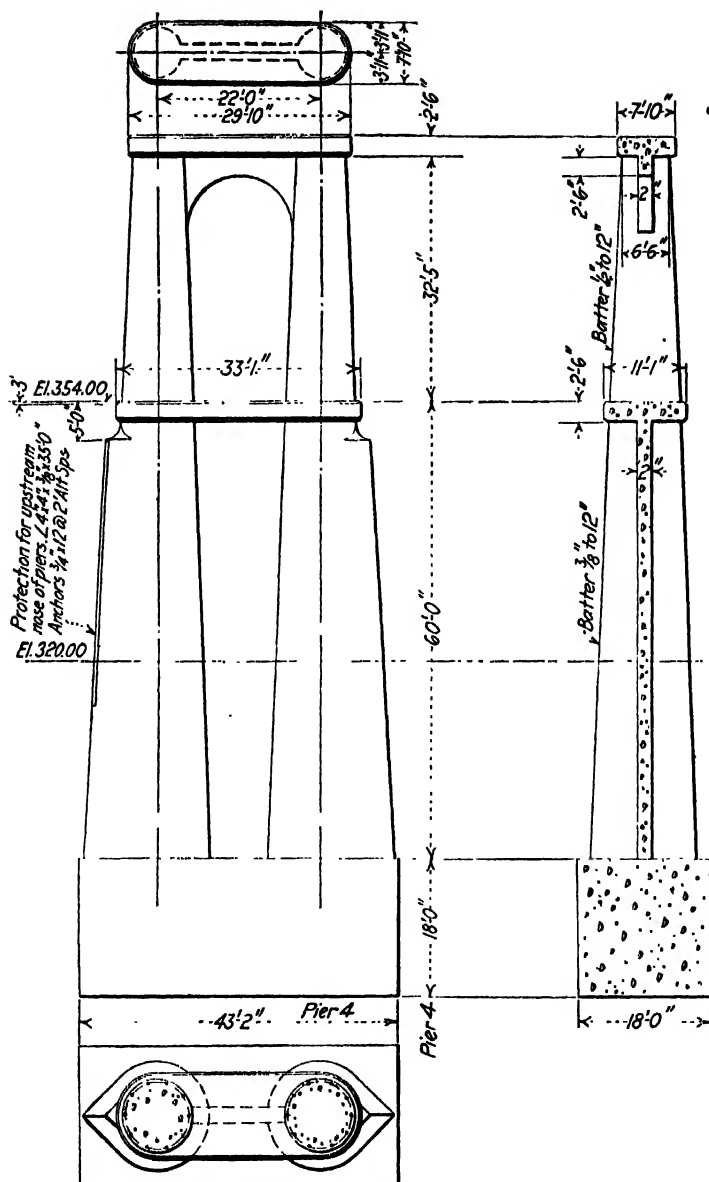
Pier of the Kennewick-Pasco Bridge over the Columbia River.
